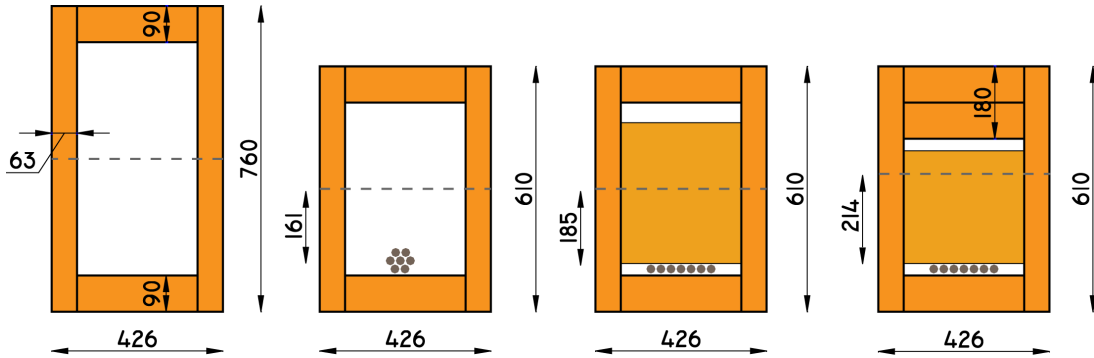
Cross-sections of beams used for experimental testing, Beam 1 was benchmark without PT, Beams 2 used straight PT, Beam 3 and 4 used draped PT
